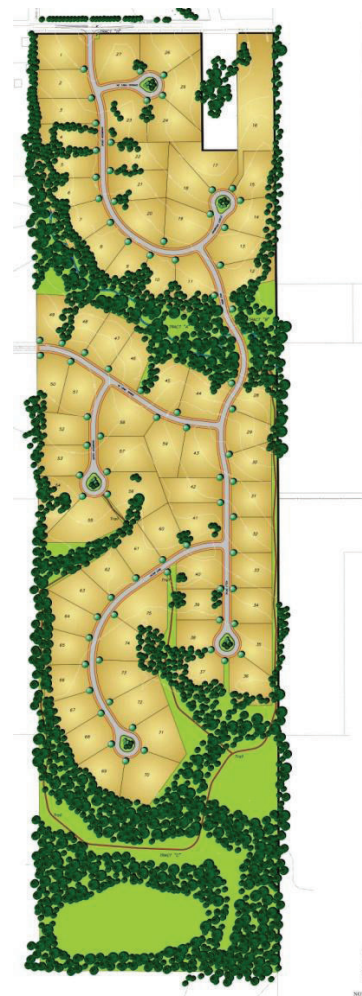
Oakbrook development site plan. Source: Shockey Consulting
